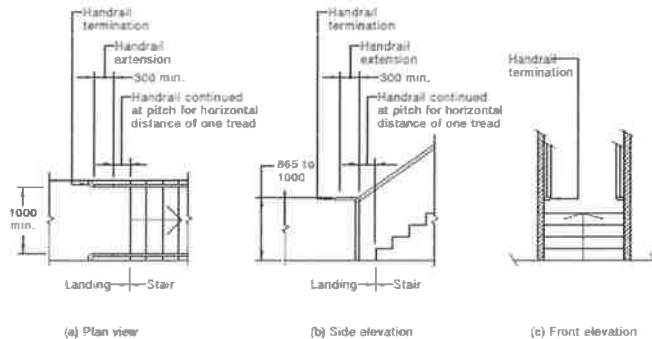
(C) STAIR HANDRAILS—HANDRAIL TERMINATIONS
